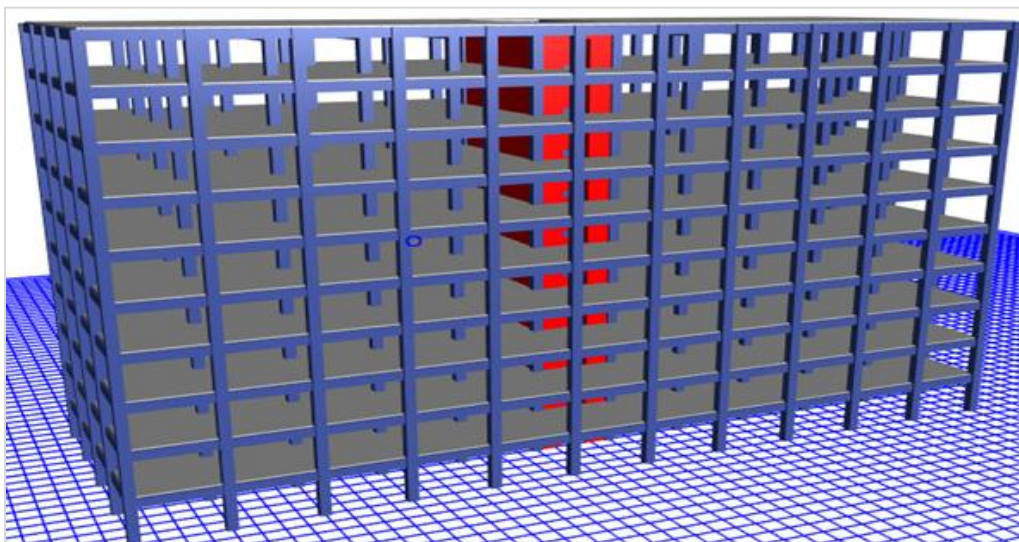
3D views of structural skeleton of tube in tube structure with core shear wall
